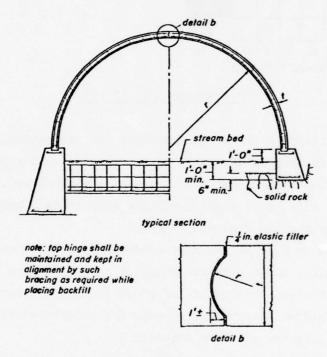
Precast circular arch culvert (courtesy of Portland Cement Association 43)
